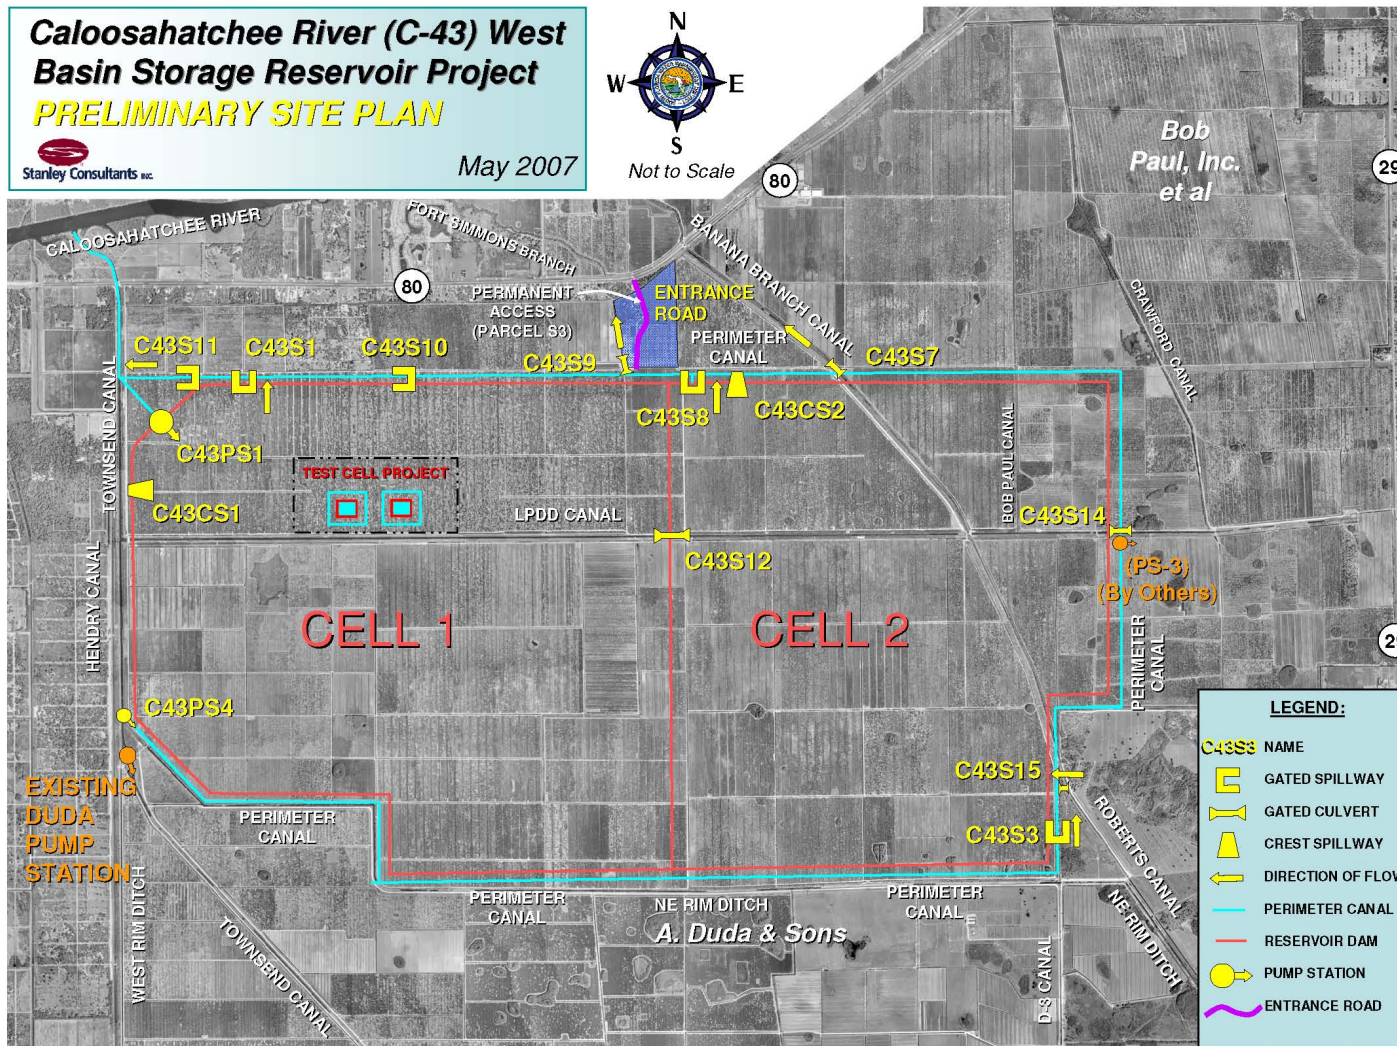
TYPICAL ALTERNATIVE SITE PLAN
